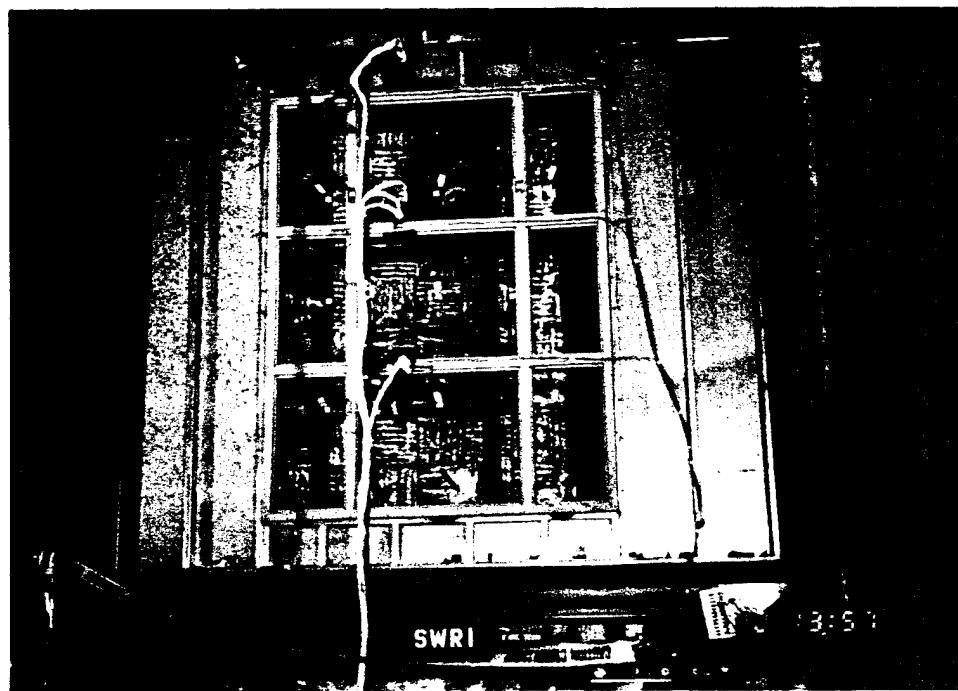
Unexposed Face of First Assembly at Beginning of Test 1;
